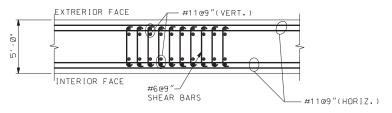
A-40 Reinforcement Arrangement of the AB MSIV House Wall (Section 1)
